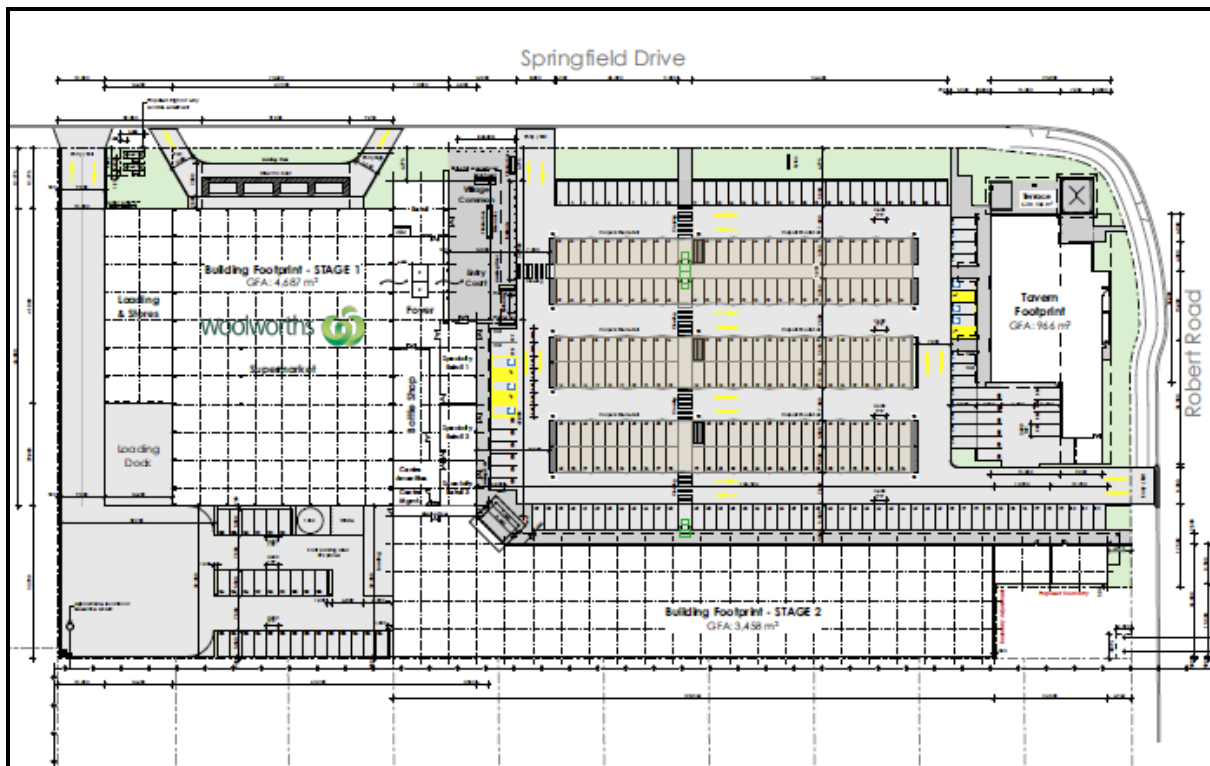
Proposed Layout (inclusive of stages 1, 2 and 3)
